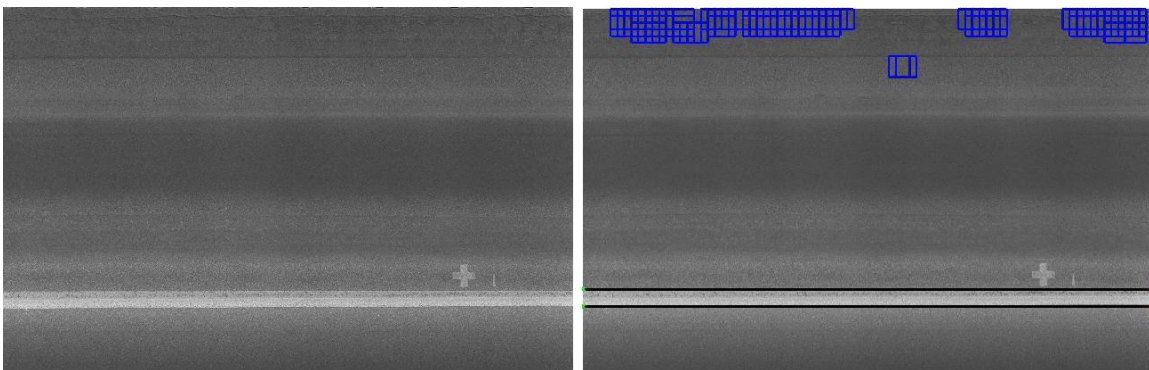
Example of longitudinal asphalt pavement cracks at medium and low severities: raw crack (left) and crack detection (right)
